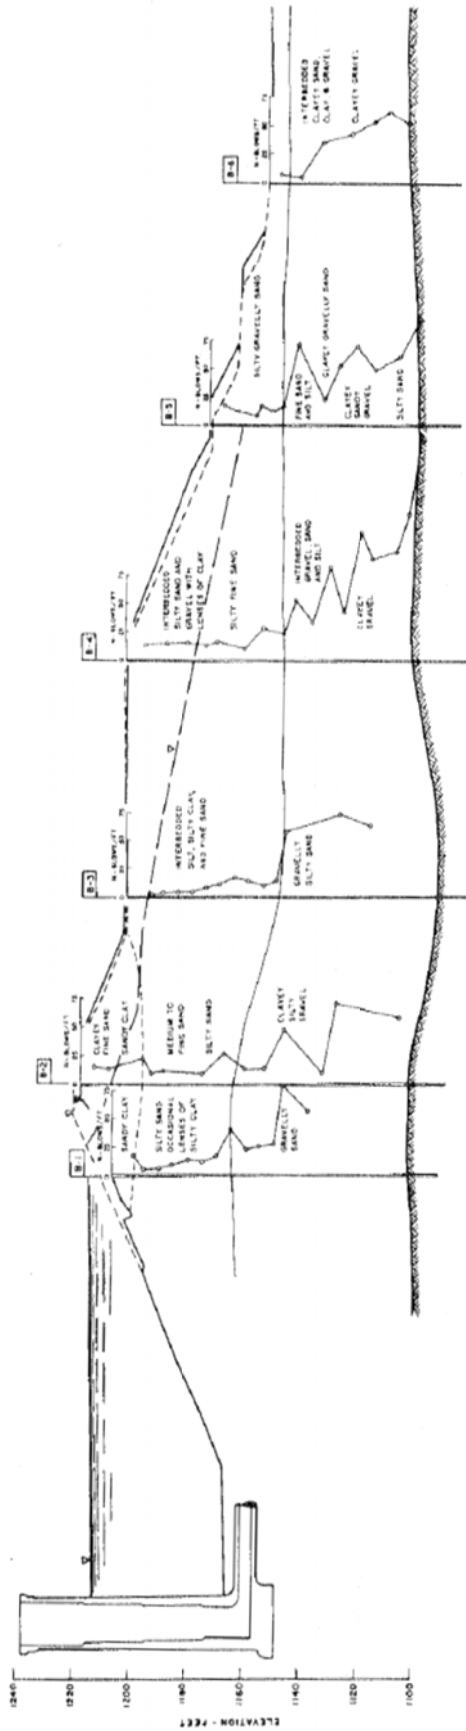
CROSS-SECTION THROUGH EMBANKMENT OF UPPER SAN FERNANDO DAM AFTER EARTHQUAKE, SECTION B-B
